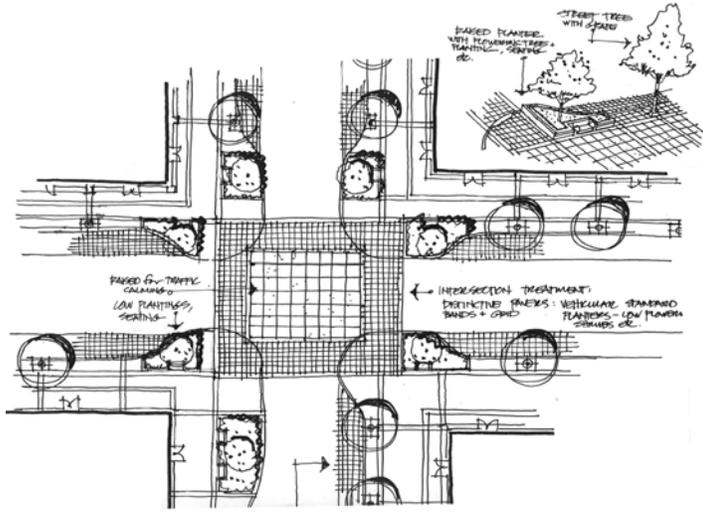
CONCEPTUAL PLAN OF INTERSECTION, IOCO ROAD & MURRAY ST.
